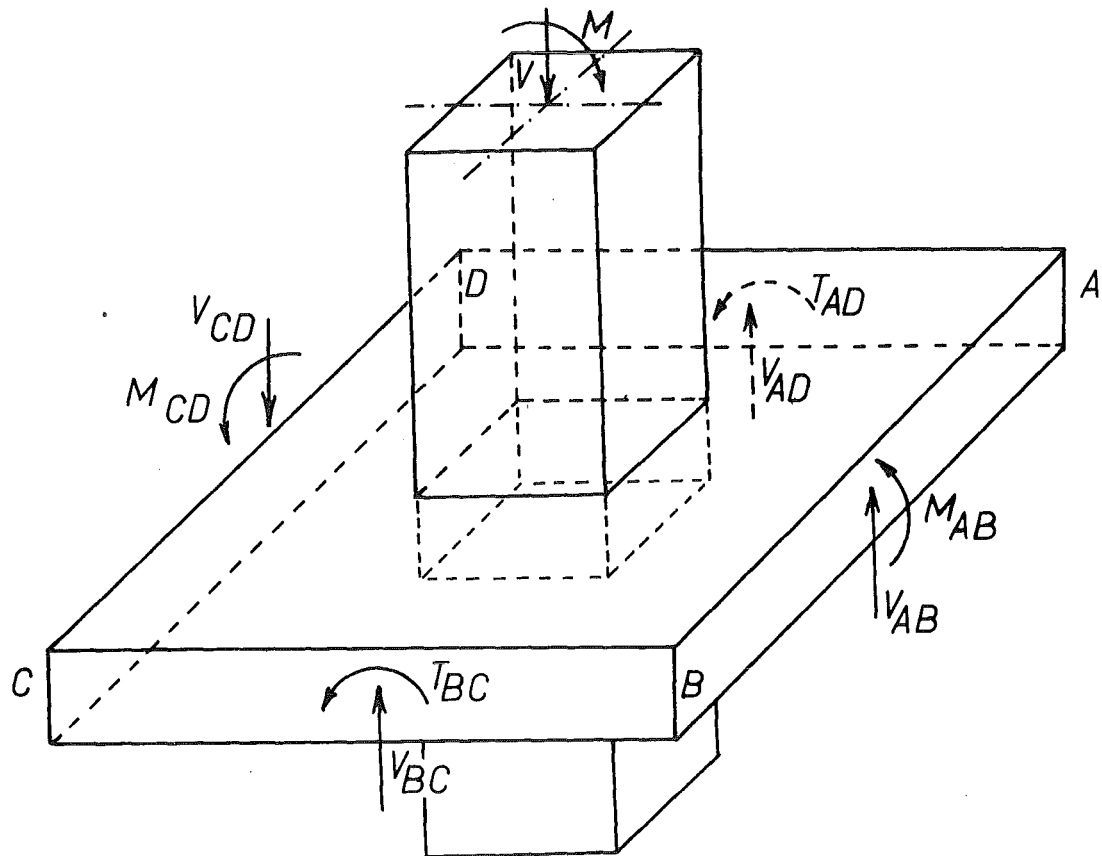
INTERIOR SLAB-COLUMN CONNECTION
